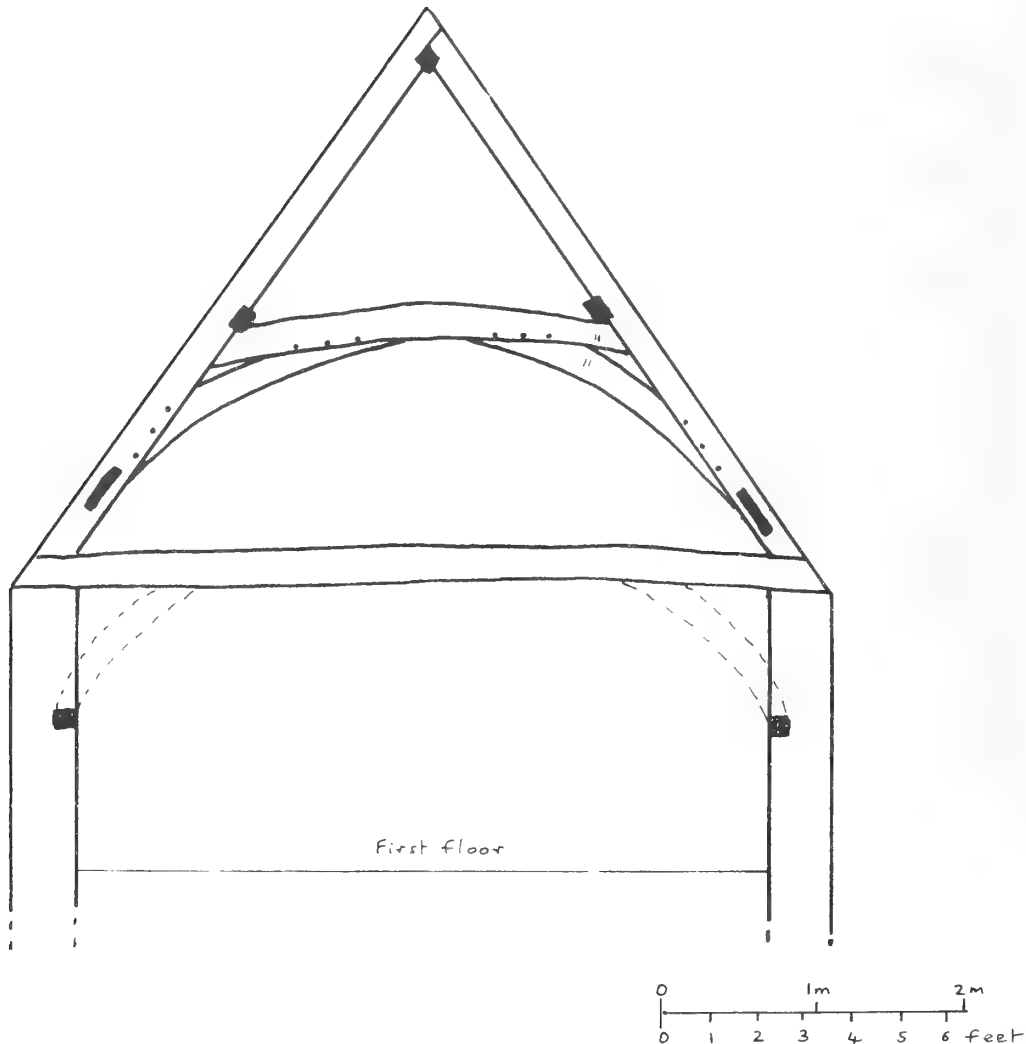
11 Silver Street, Bradford-on-Avon. Open truss of the ball looking N.
